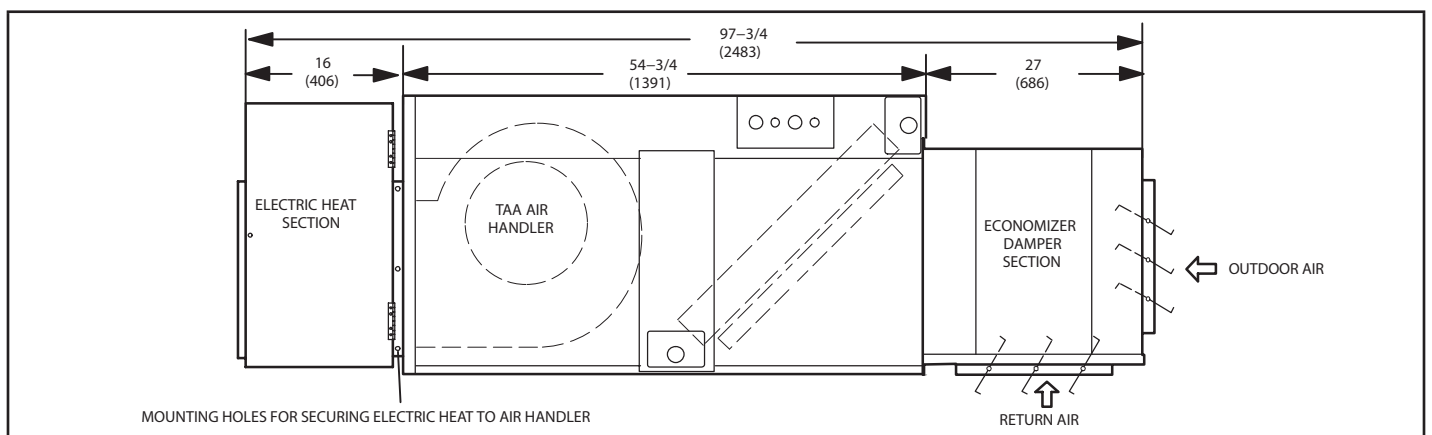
TAA Horizontal Application - Dimensions - inches (mm)
